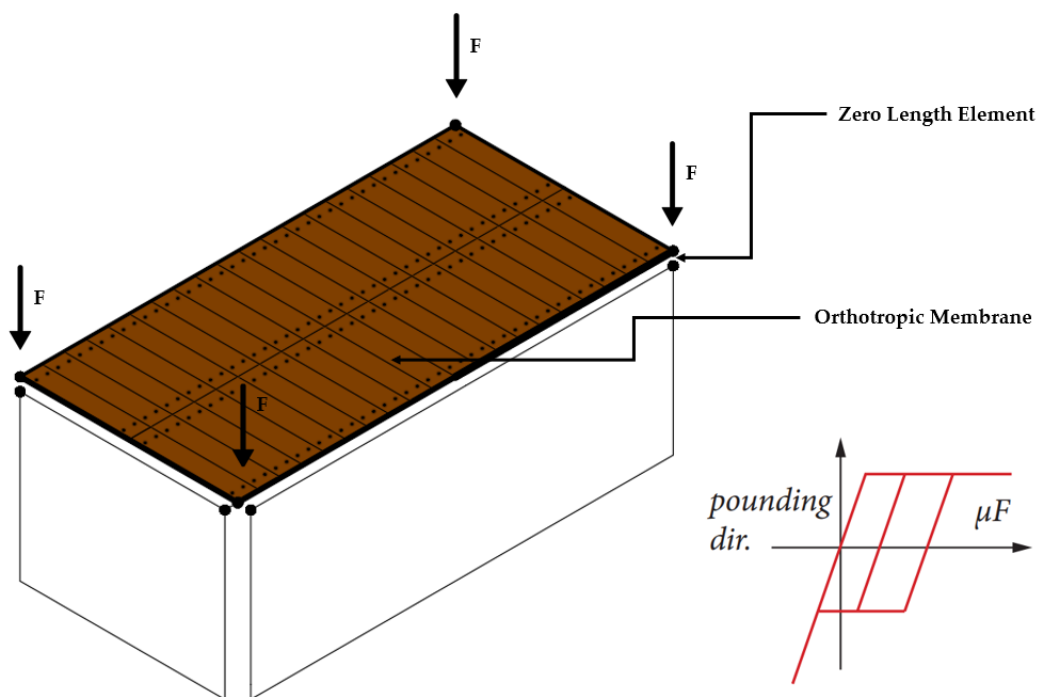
Definition of zero-length elements for modelling the floor-to-wall connections.
